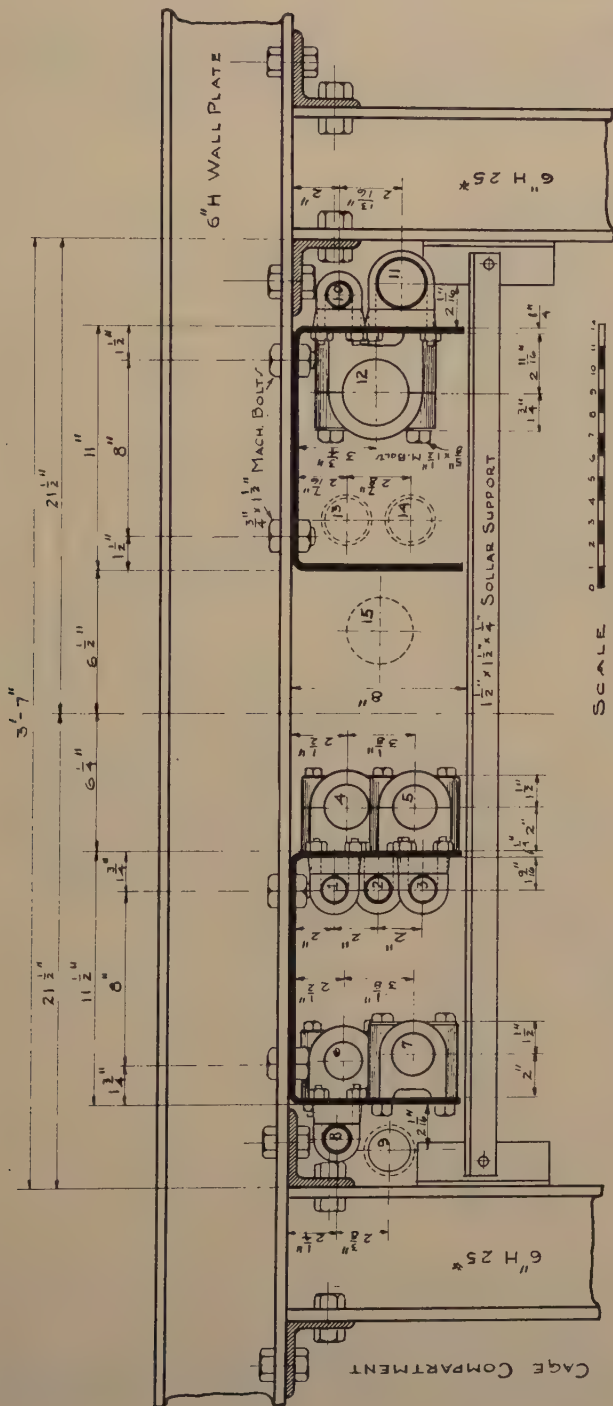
PLAN OF SHAFT CABLES AND CONDUITS IN ROSS SHAFT, SHOWING METHOD OF SUPPORT.
